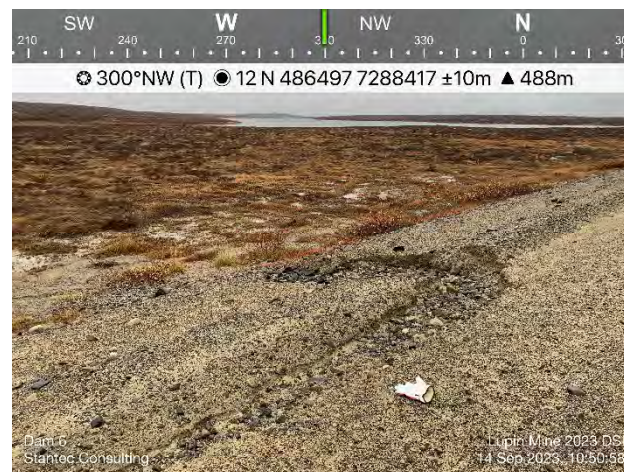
An erosional feature situated near the crest on the downstream embankment at Dam 6.
